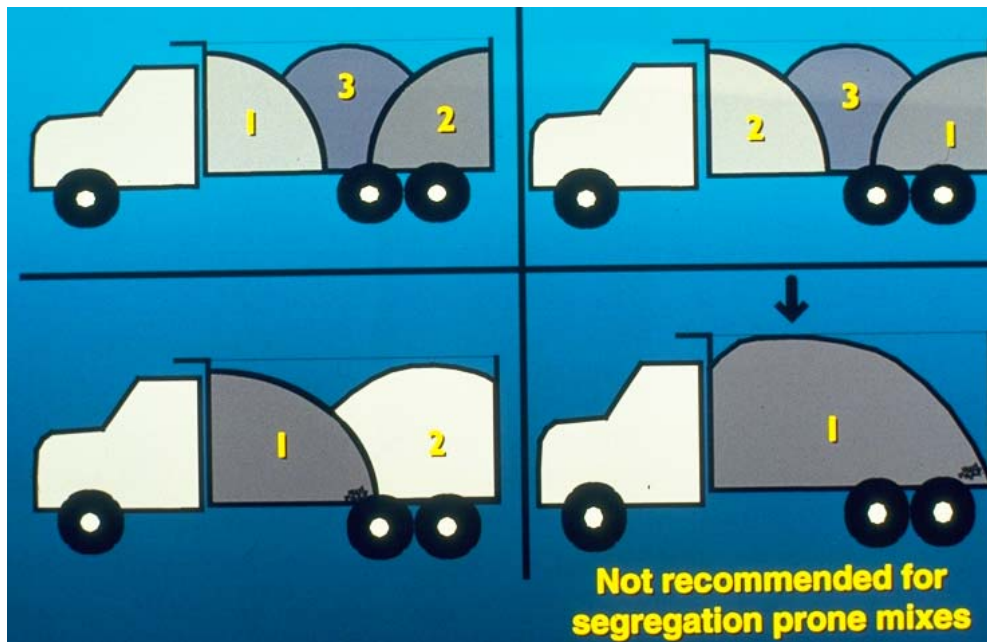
Recommended truck loading procedures to minimize segregation
